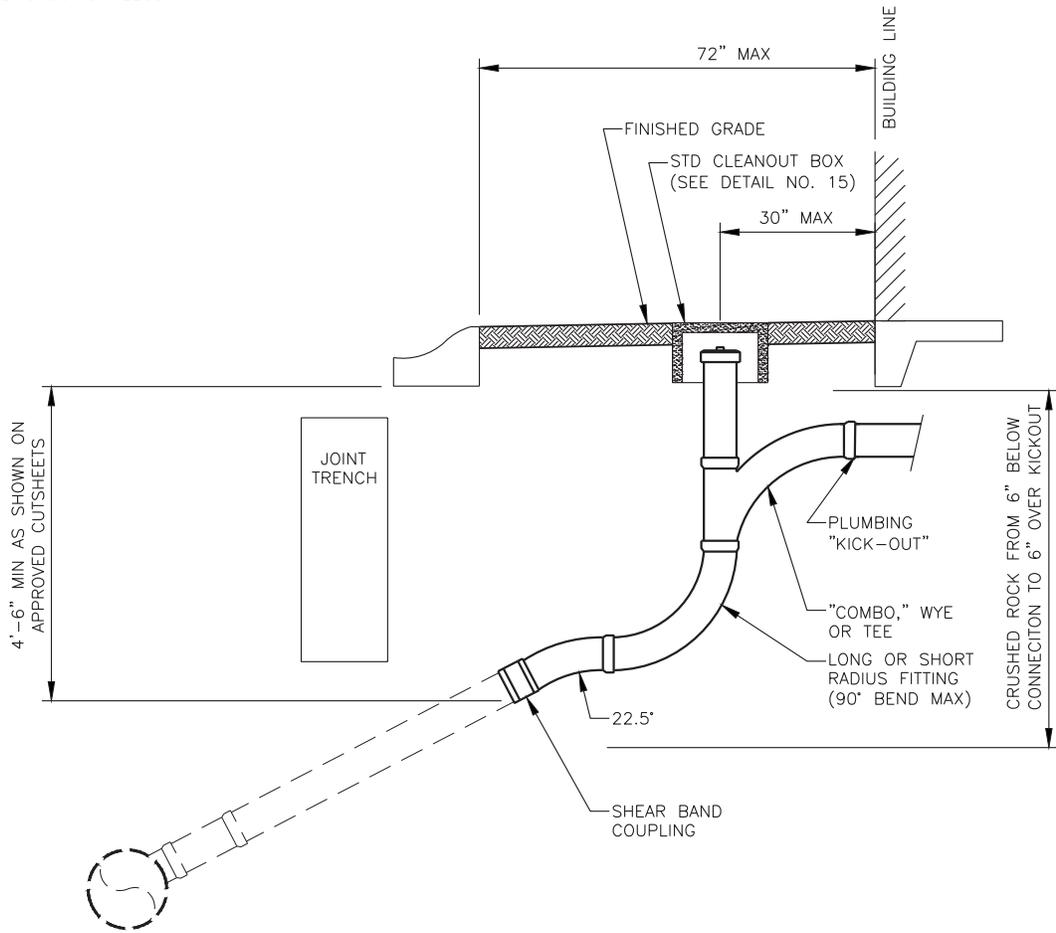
DETAIL - BUILDING SEWER ADJACENT TO BUILDING FOOTING
